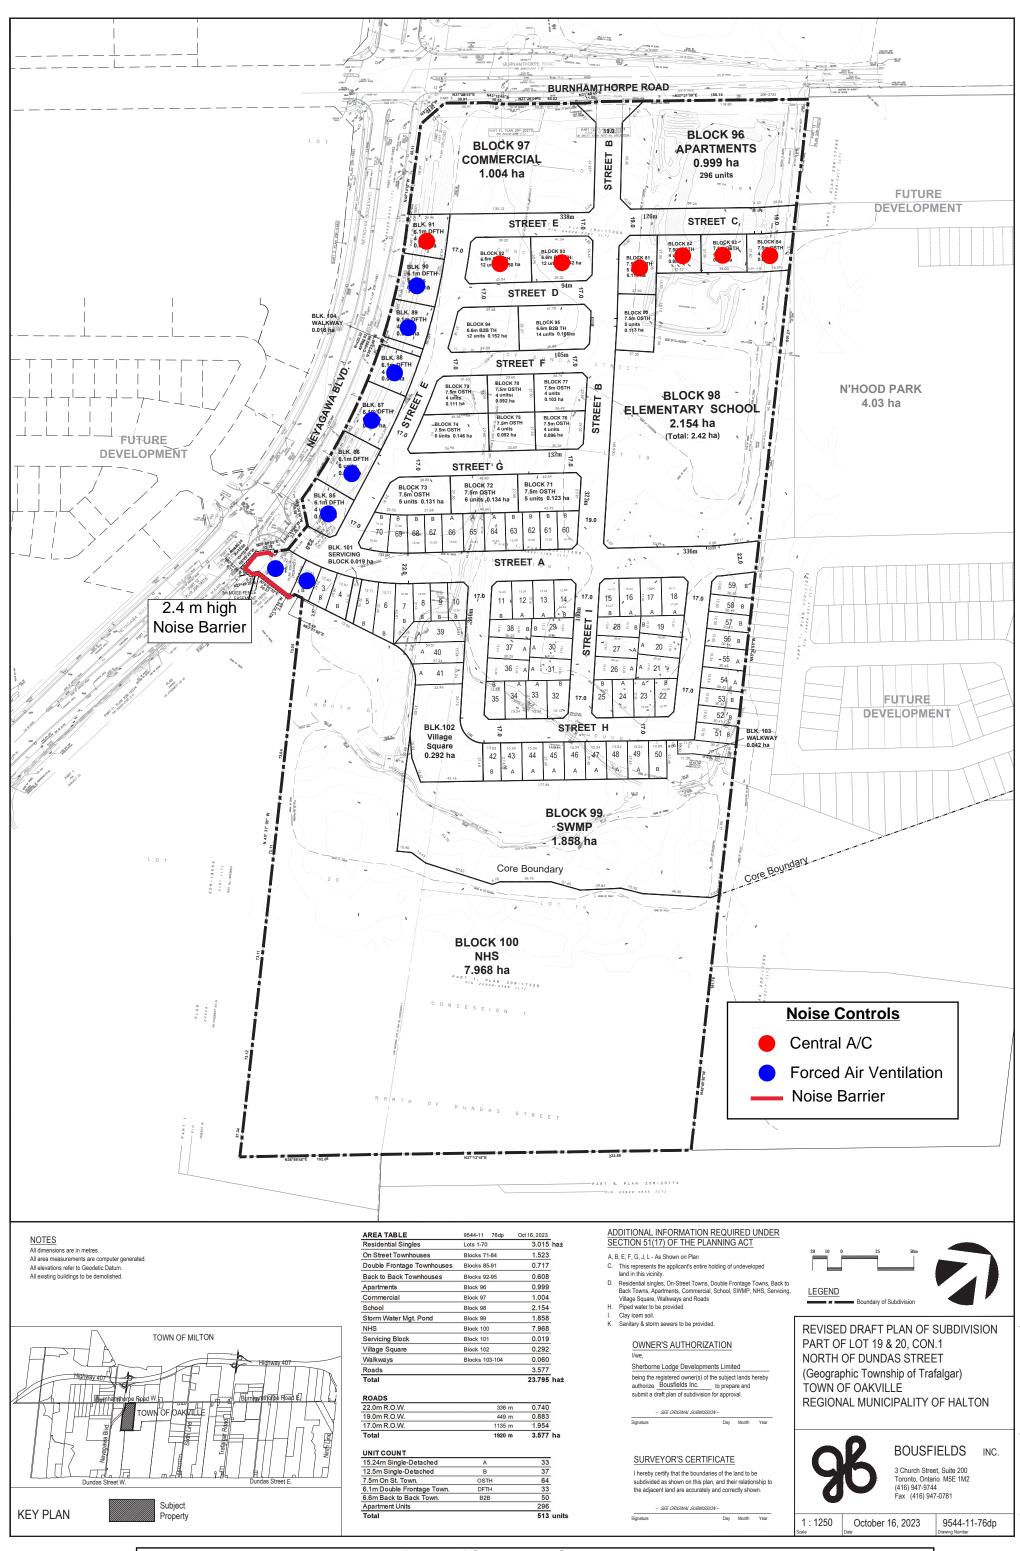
Draft Plan of Subdivision Showing Prediction Locations
